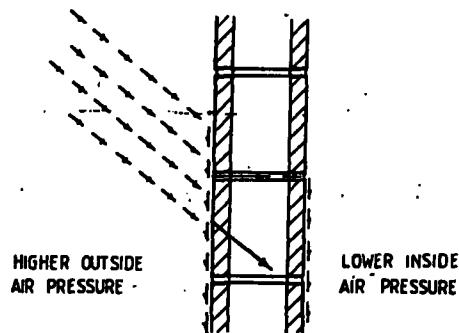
REINFORCED CONCRETE MASONRY WALL
